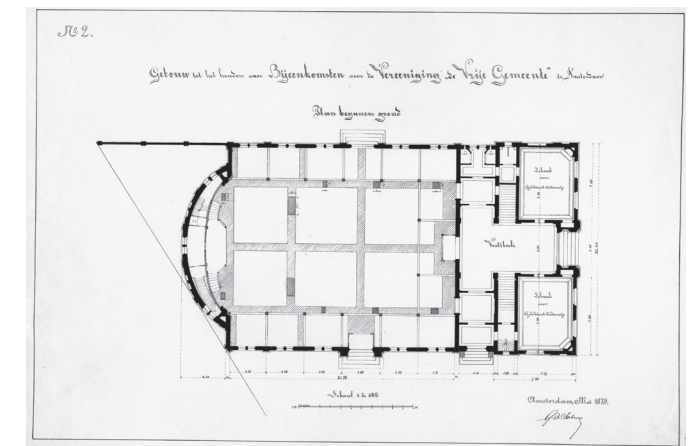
Paradiso - Floorplan of ground floor (Salm, 1879)
